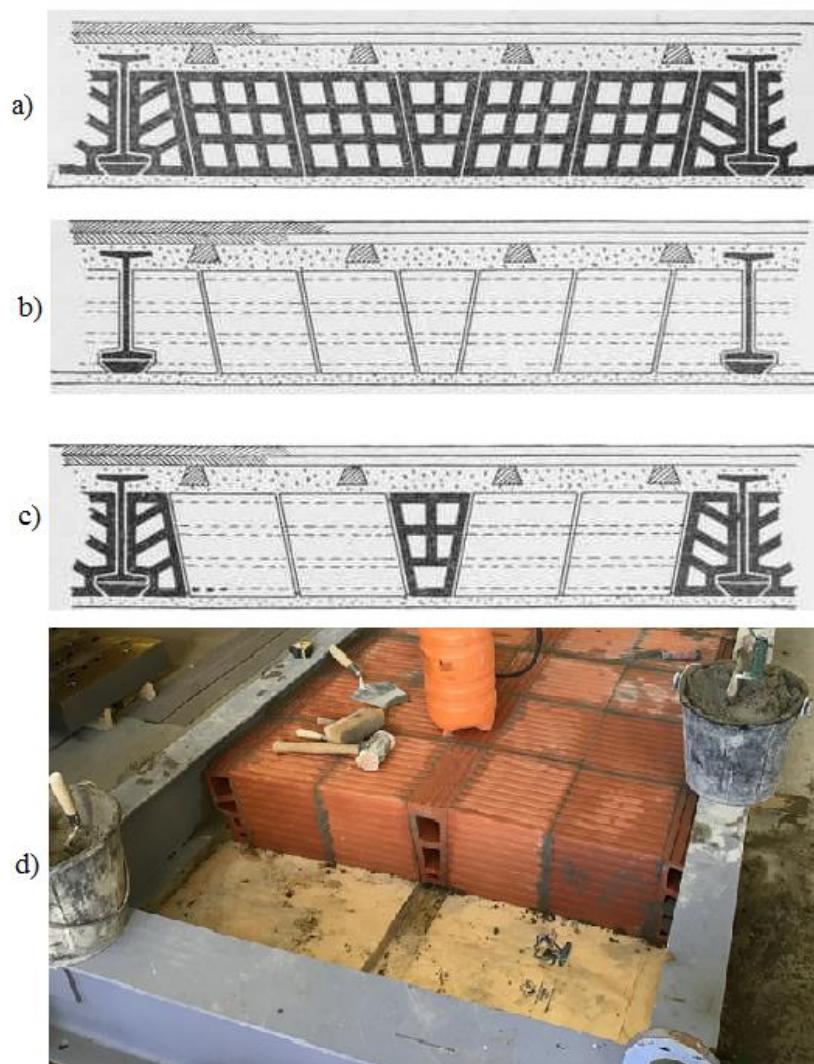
Types of terracotta flat arch construction: a) Side construction, b) End construction, c) combination of Side and End construction [2], and d) a sample of terracotta floor constructed in the NRC's structural lab
